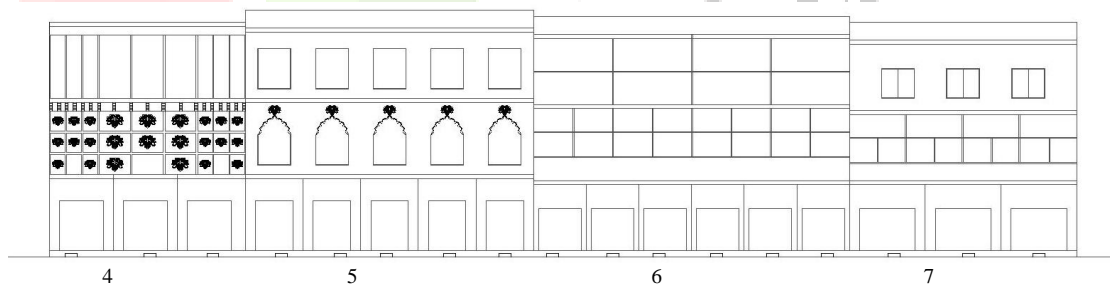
(c). Elevation 1 of patch 1 (Source: Author)
